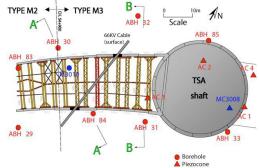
Plan showing location of diaphragm wall panels and 9th level strutting system (Whittle and Davies 2006)
